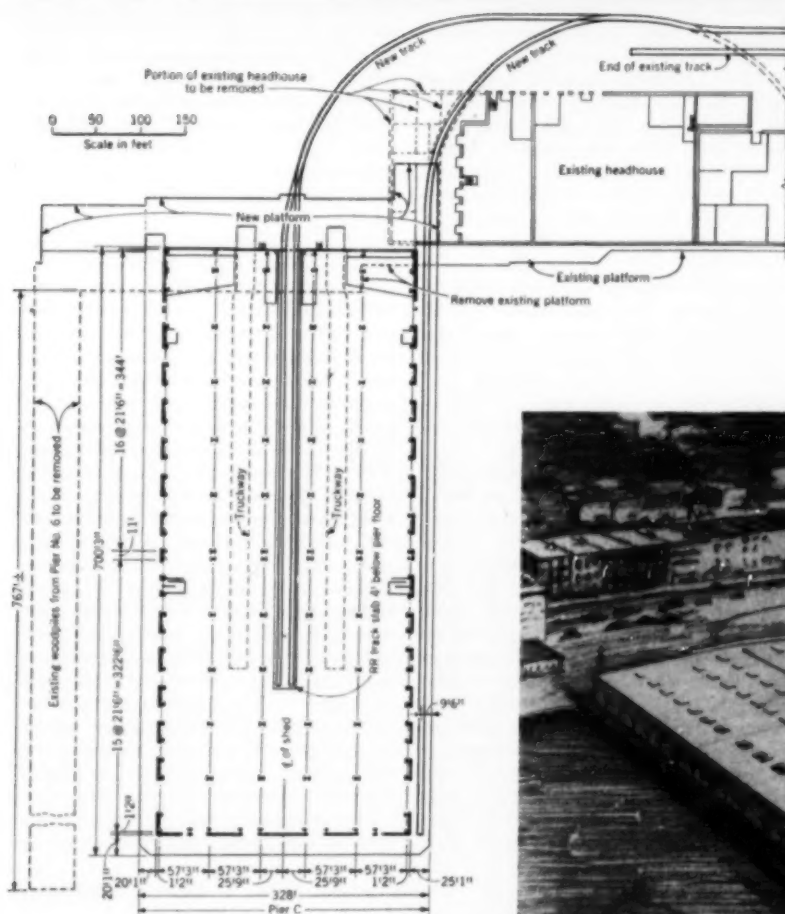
Spaciousness of work area on Pier C, to be widest in Port of New York, is evident from open column layout. Railroad tracks down middle of pier are depressed to permit unloading at platform level. Plan is arranged so as to permit use of pier by two tenants.
